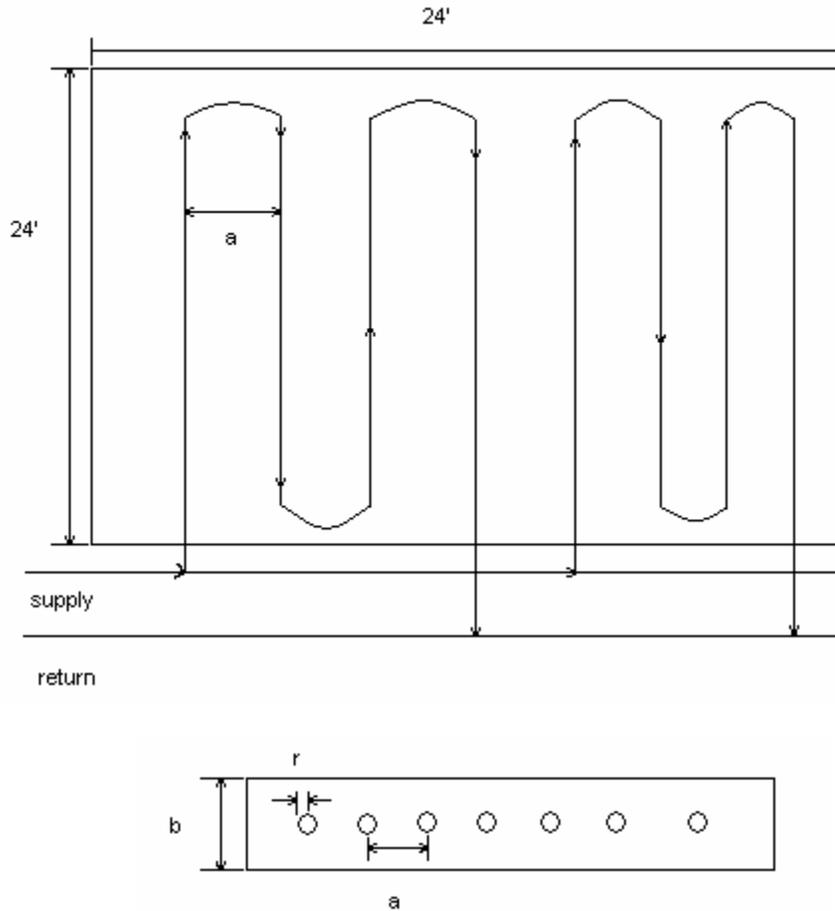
Plan view of the hydronic piping lay out on a section of the bridge deck (top). Cross sectional view of the bridge deck (bottom). Not shown is a layer of insulation below the tubes.
